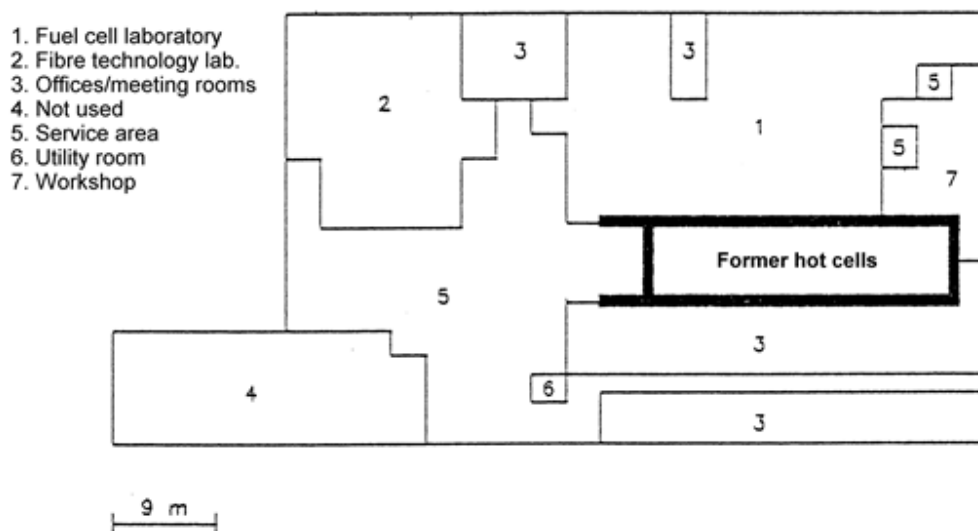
Location of the cells in the building (ground floor) and the former use of adjoining areas.
